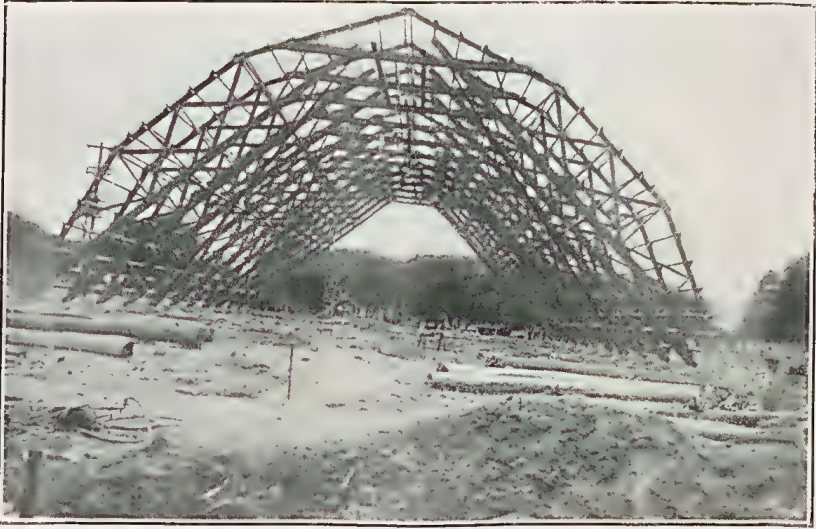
THE LARGE STORAGE SHED AT BOWEN SALT WORKS. Showing details of construction, which is of wood on concrete base; capacity, 7,000 tons.
